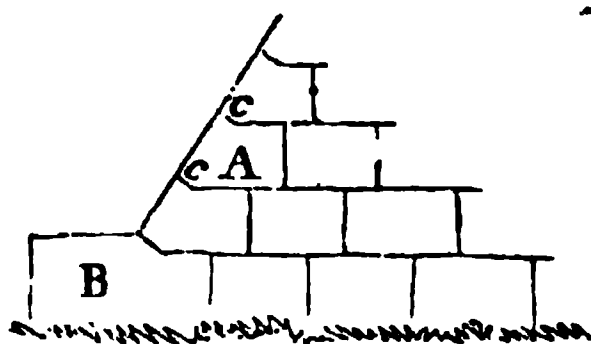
Represents the arrangement of stone with abutting, or elbow joints for very inclined surfaces.
